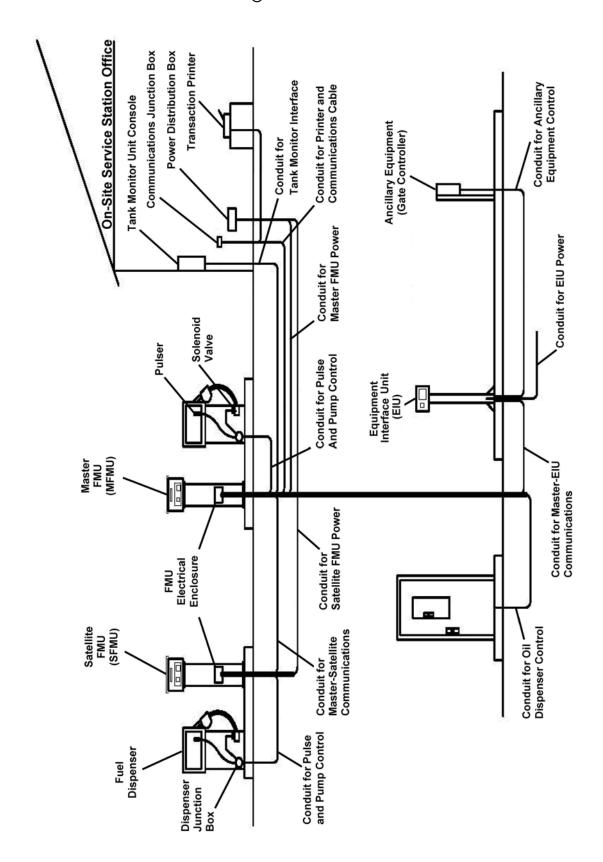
Sample Site Layout (Mechanical Dispensers)
